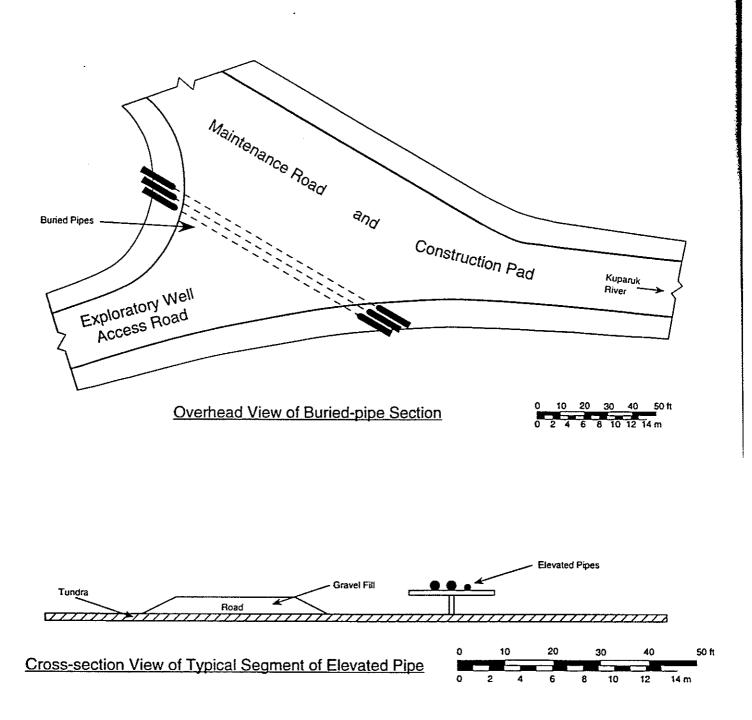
Overhead view of the buried-pipe section and a cross-section view of a typical segment of elevated pipe parallel to a road in the western portion of the Prudhoe Bay oil field. The diagrams depict part of a study site ("Pipe Site") of Curatolo and Murphy (1986). Location of site is shown in Fig. A-5.
